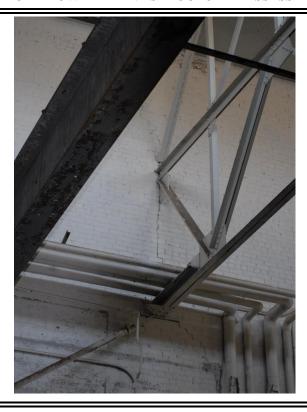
1910 roof truss diving into center wall, with crack between top and bottom chords of truss.
